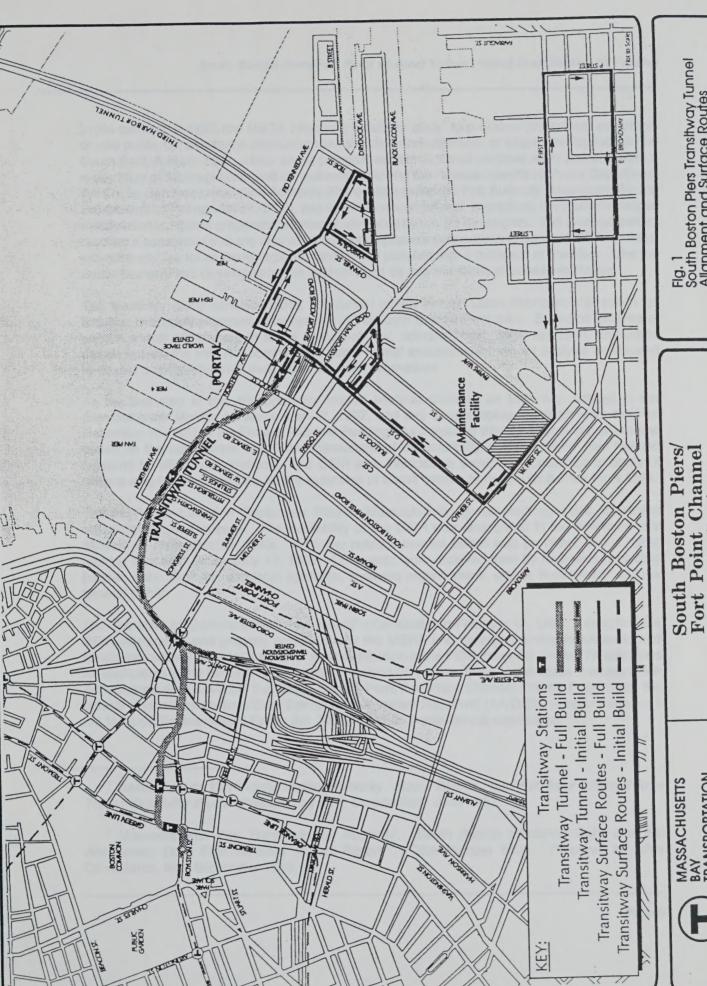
South Boston Plers Transltway Tunnel Alignment and Surface Routes
